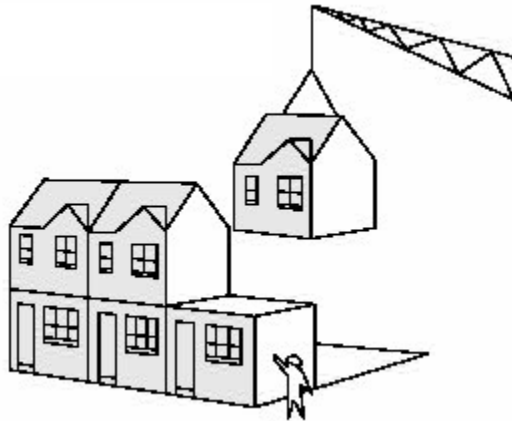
Type of Prefabricated timber frame housing construction.
